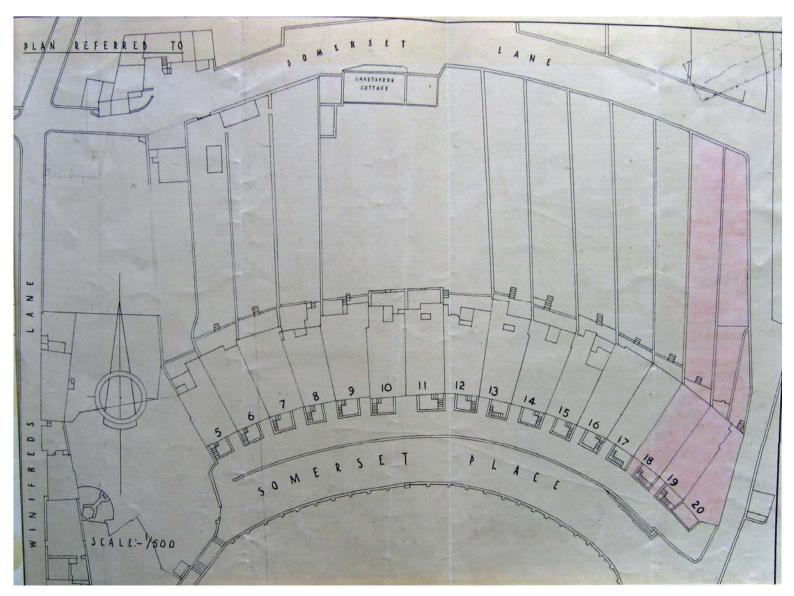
1964 plan of Somerset Place (FH: 11 April 1964)
